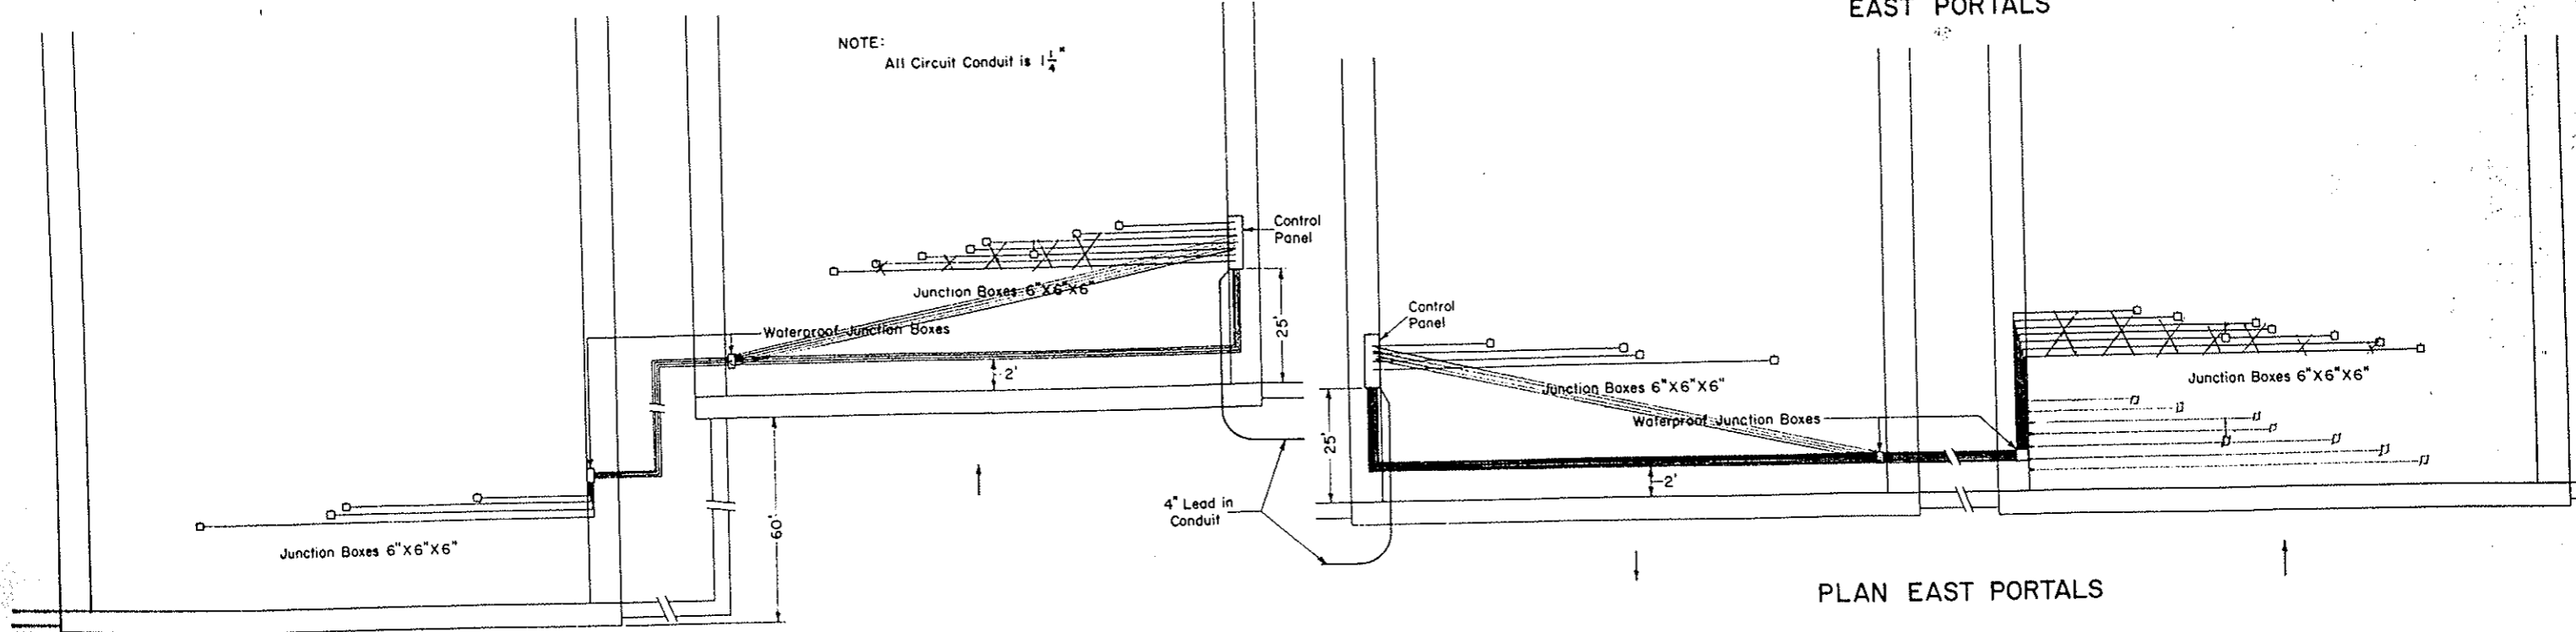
DETAILS OF ELECTRICAL INSTALLATION FOR FUTURE LIGHTING
